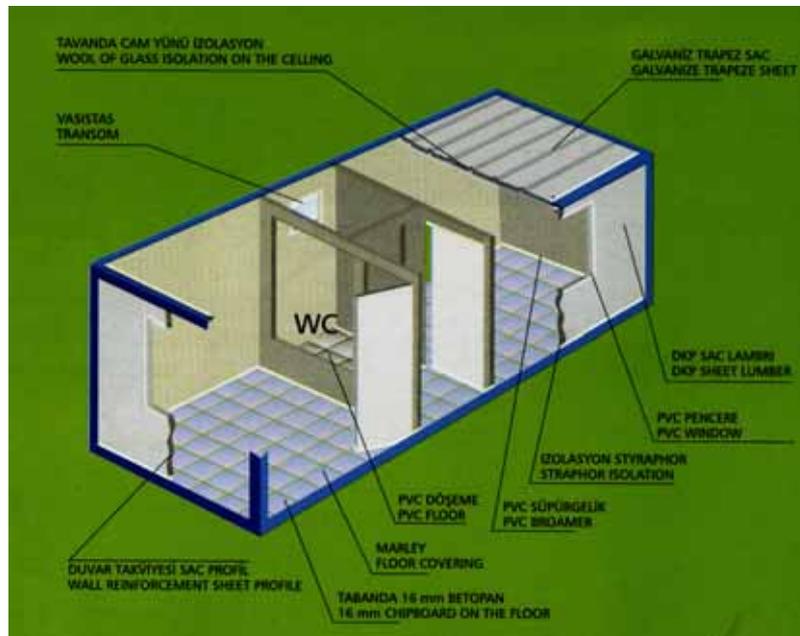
The structure of the module of (Prefabrik Yapı)
